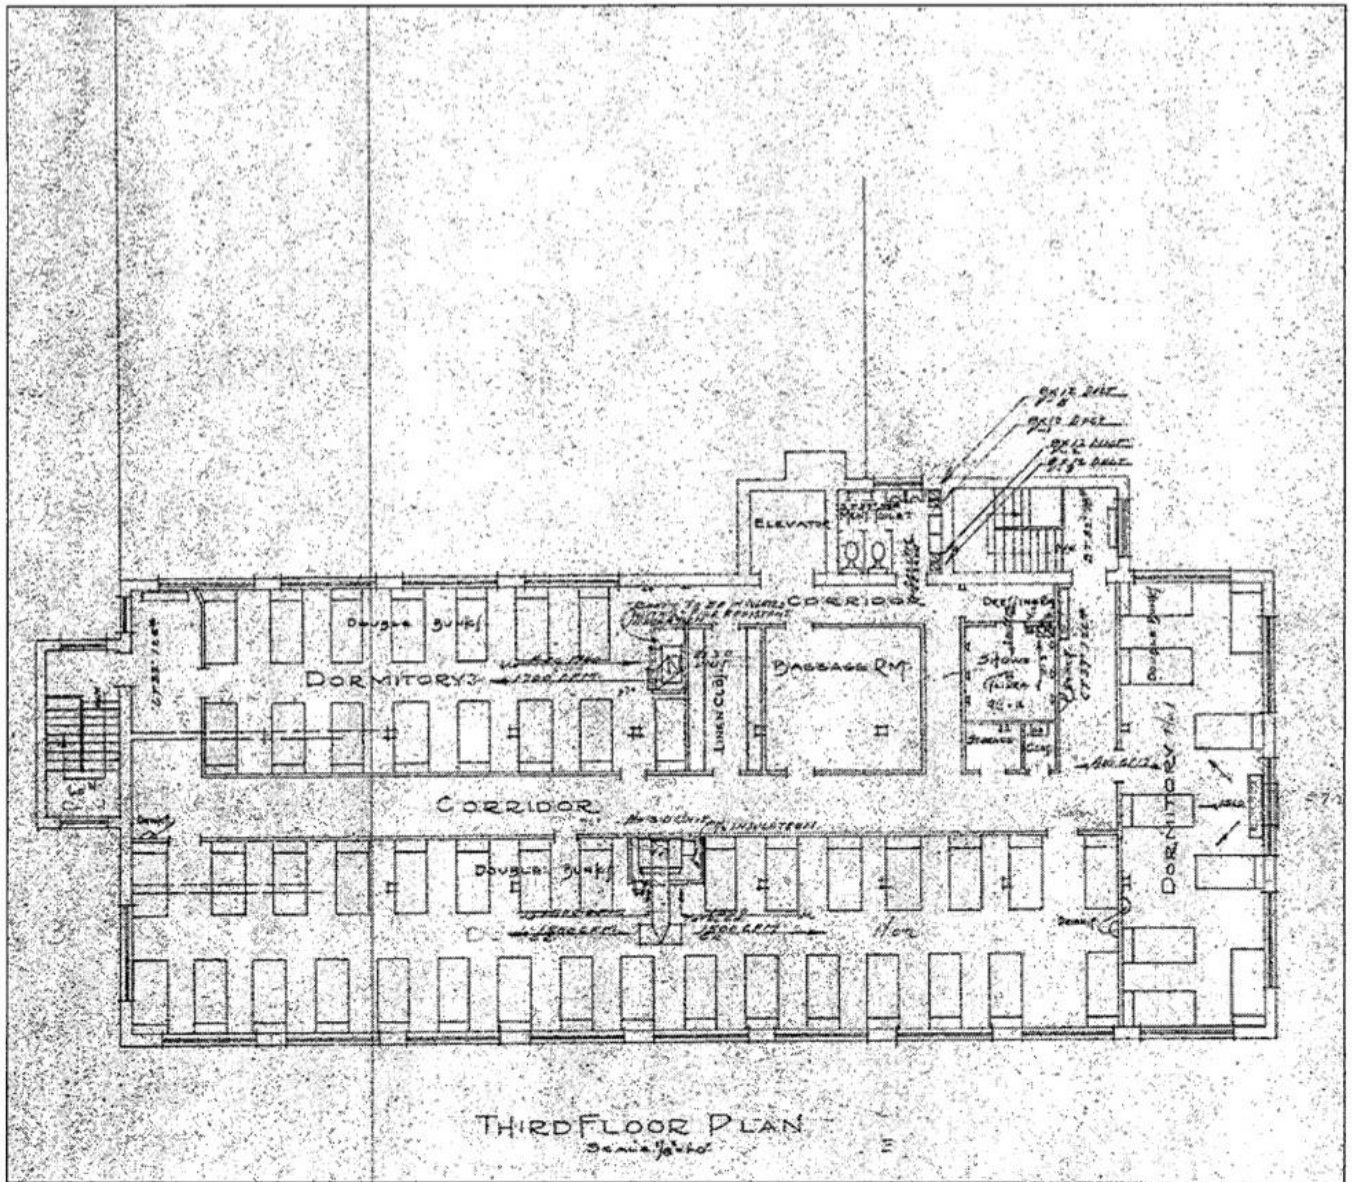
Third Floor Plan – NYA Construction Drawings, 1941.
